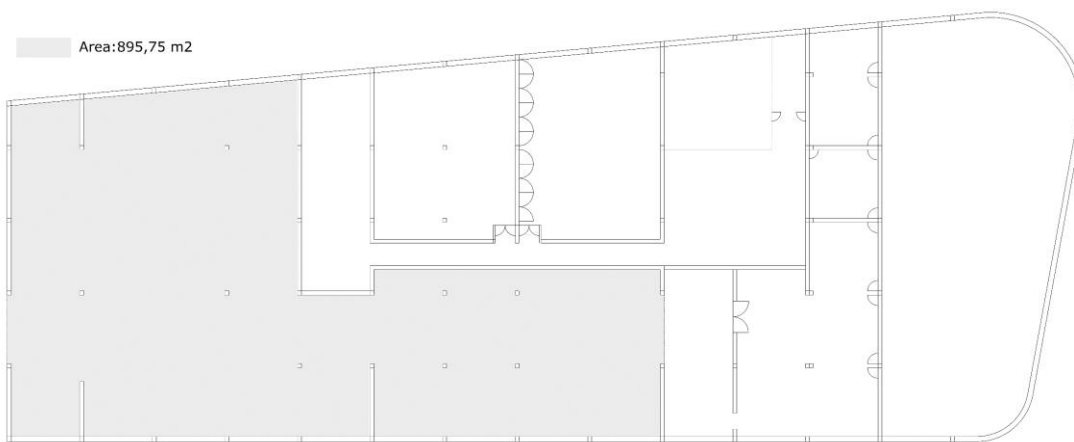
Plant of the exhibition space of Núcleo de Arte, floor 1.
